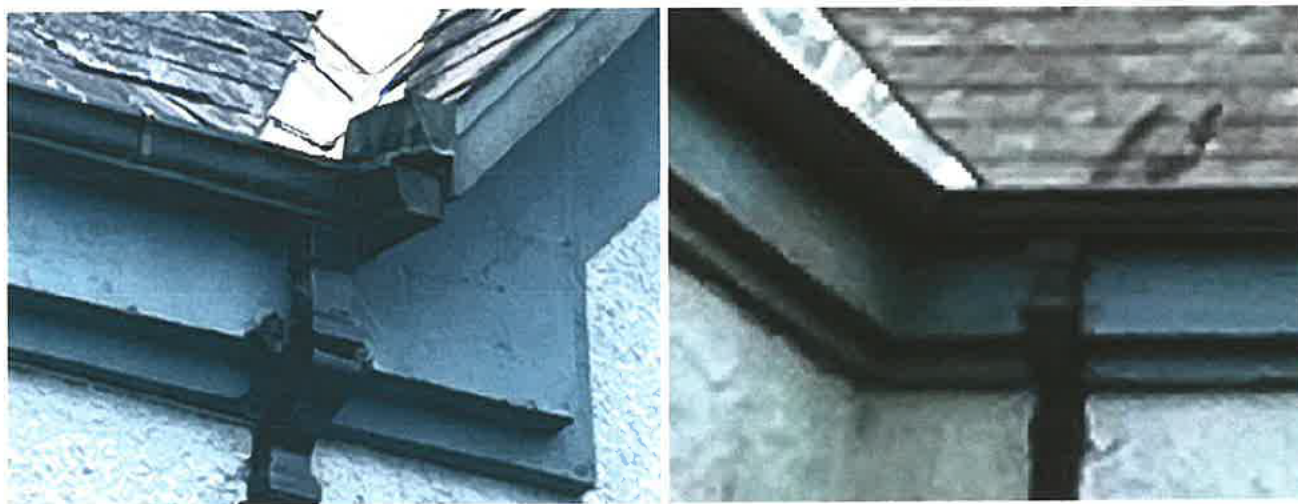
; Base of south-east valley gutter. Photo 36; Base of north-west valley gutter.
